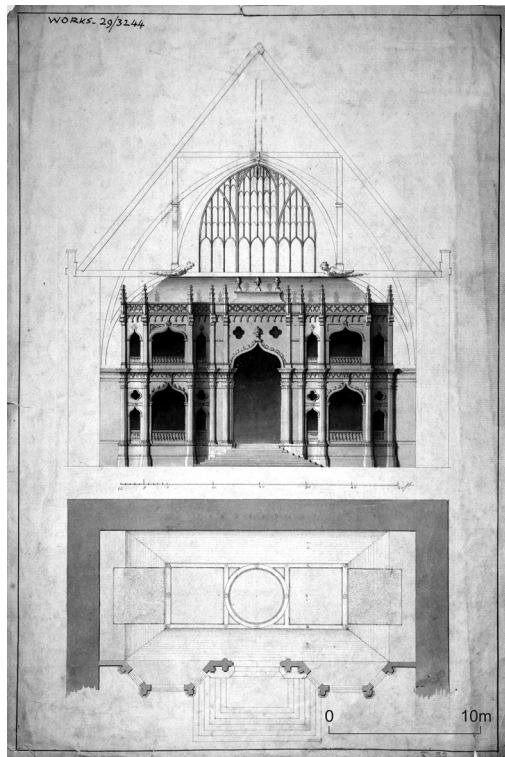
Plan and elevation of the new law courts in Westminster Hall in 1746 (TNA: PRO, WORK 29/3244)
